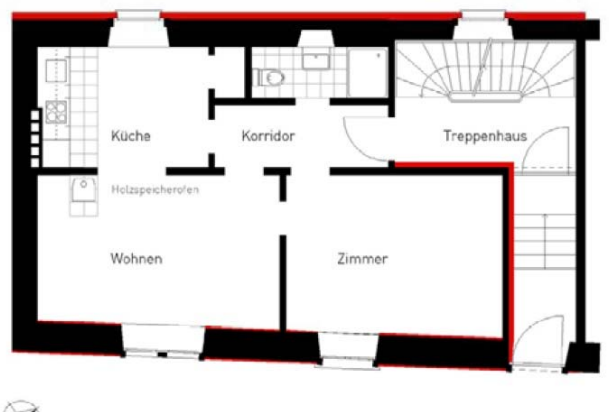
Magnusstrasse - Ground floor plan after retrofit
